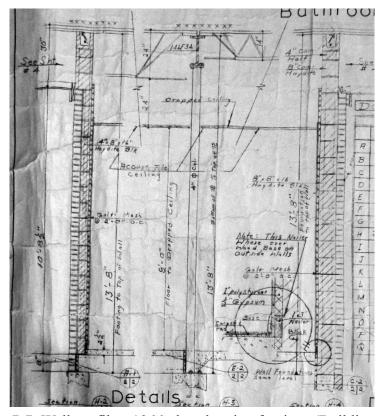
Wall profiles, 1966 plan showing footings (Building plans)
